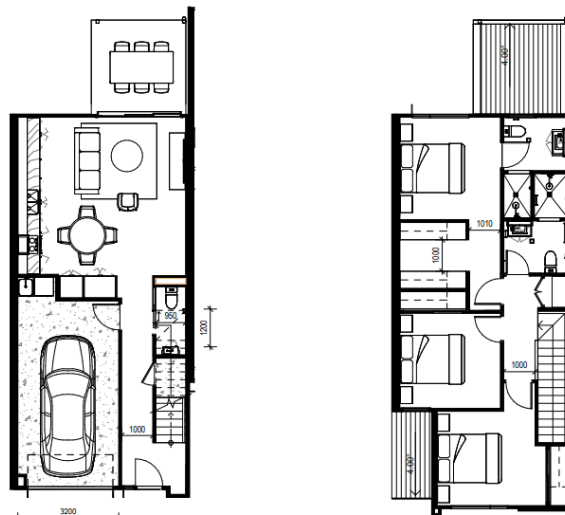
Floor Plans – Mason Unit Type Typical (M1)
